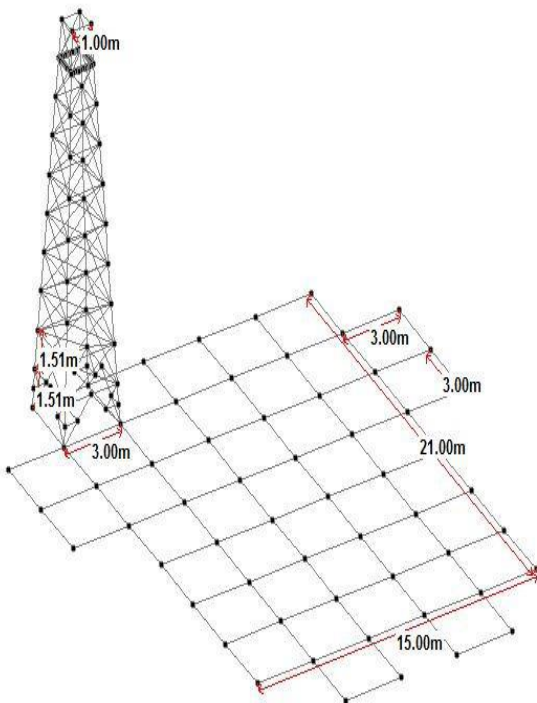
Case A of Telecommunication Tower Over Roof of Position P1
